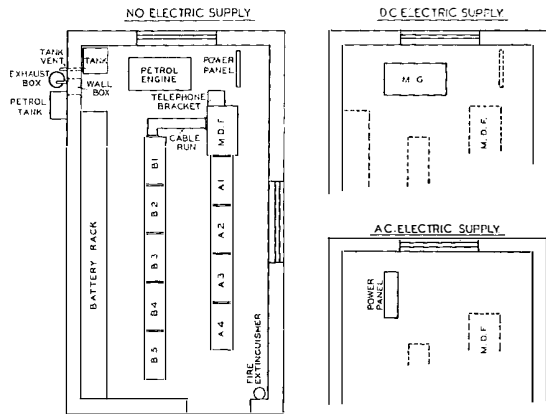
LAY-OUT USING B TYPE BUILDING.
